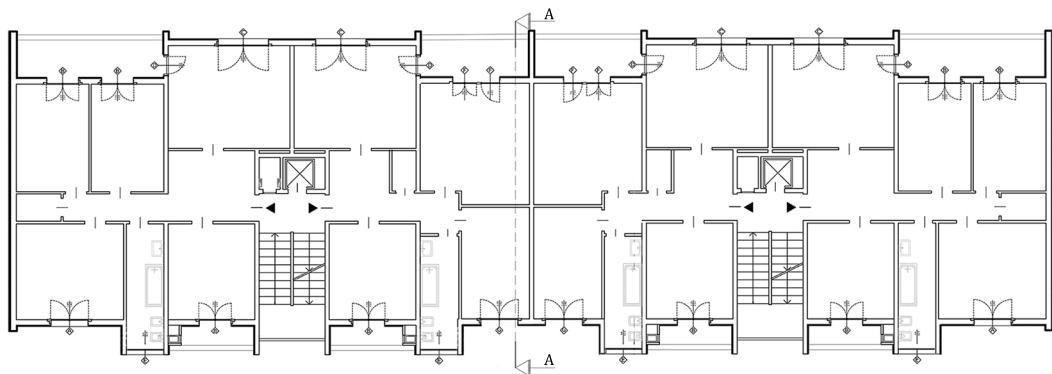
Normal Floor Plan of Building Type B (Reference Building)
